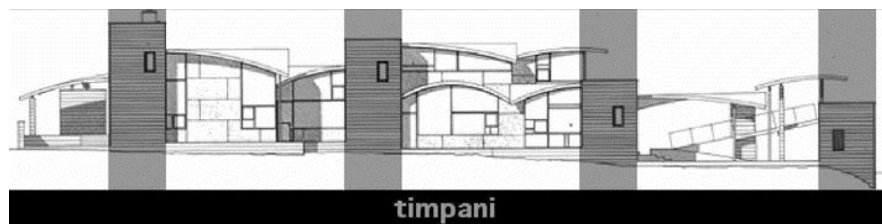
Stretto House Timpani Interpretation (Spatial Dam) (Capanna, 2009, P.270)
